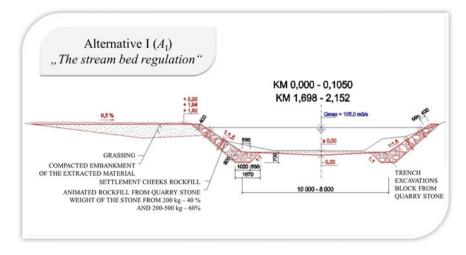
Typical cross section of the stream, scale unspecified (after Zeleňáková et al. 2011)
